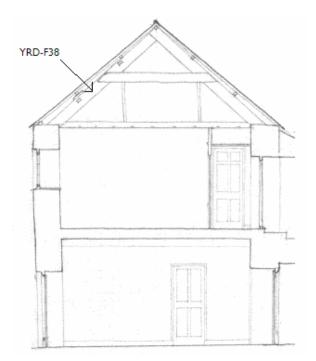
South-facing section through the North-South range, showing truss 2 and the location of sample YRD-F38 (Architecton, section position shown on Fig 16)
